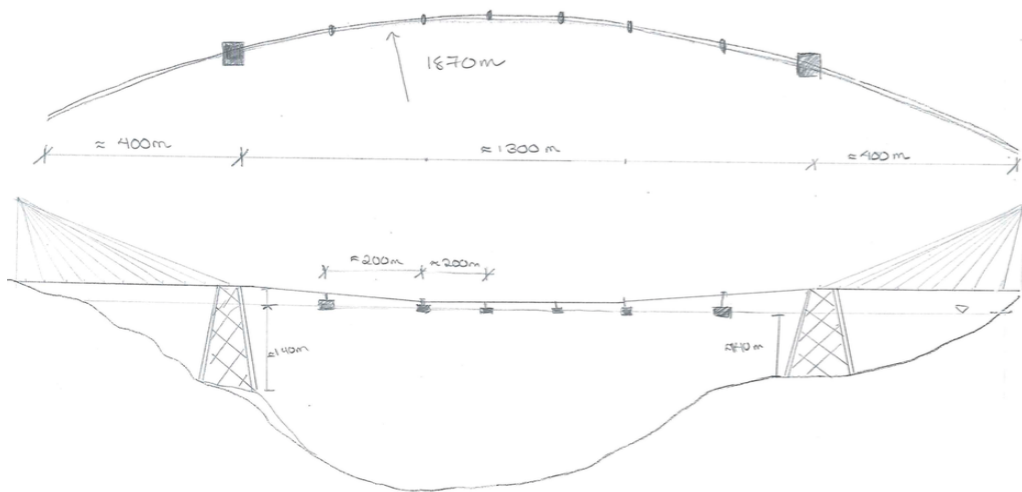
Sketch of the II-Jacket concept proposed for crossing the Halsafjord
